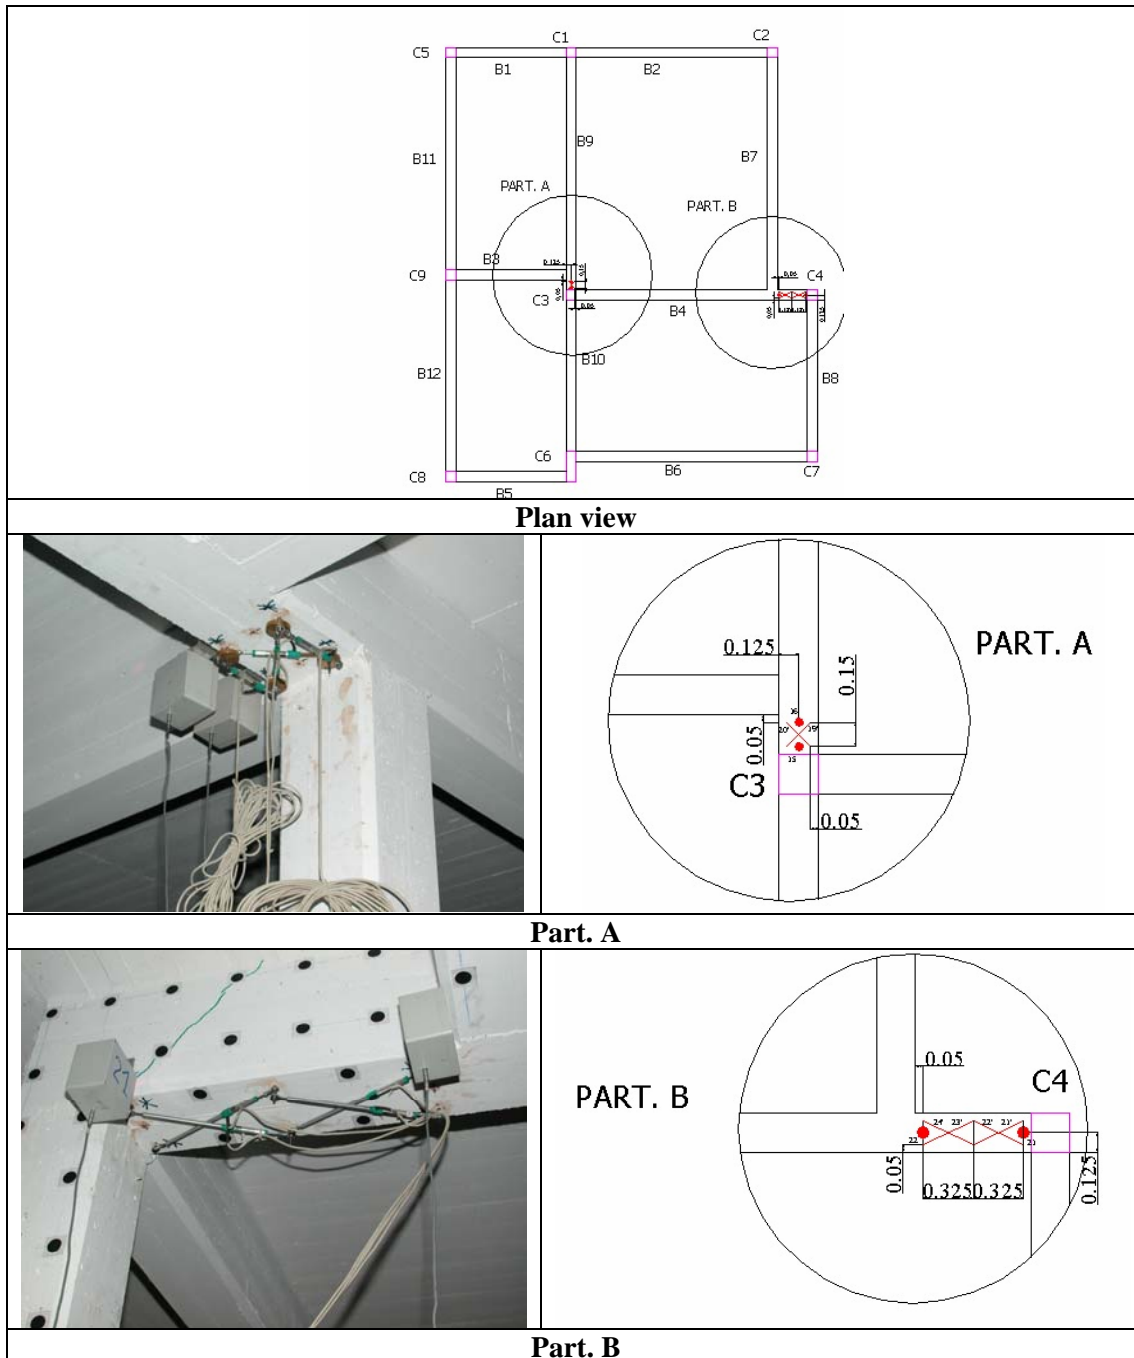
Inclinerometers on beam-on-beam intersections.
